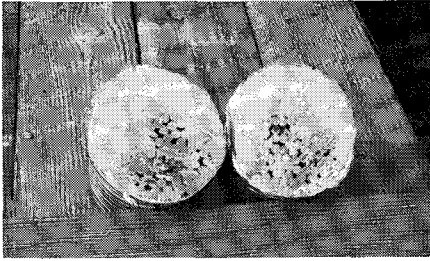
90-wire grouted tendon cross-section cut from test beam with tendons on 20-ft. (6 m) radius
